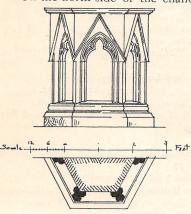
HALF PLAN AND ELEVATION OF FONT.
